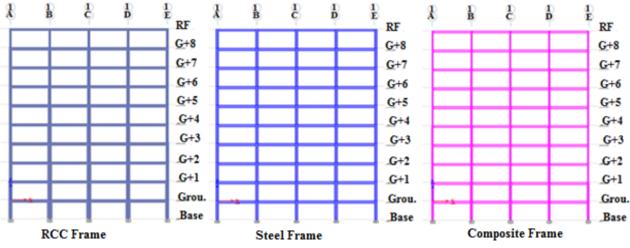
12: Elevation Model of RCC, Steel and Composite Frame for G+8 Alternatives
